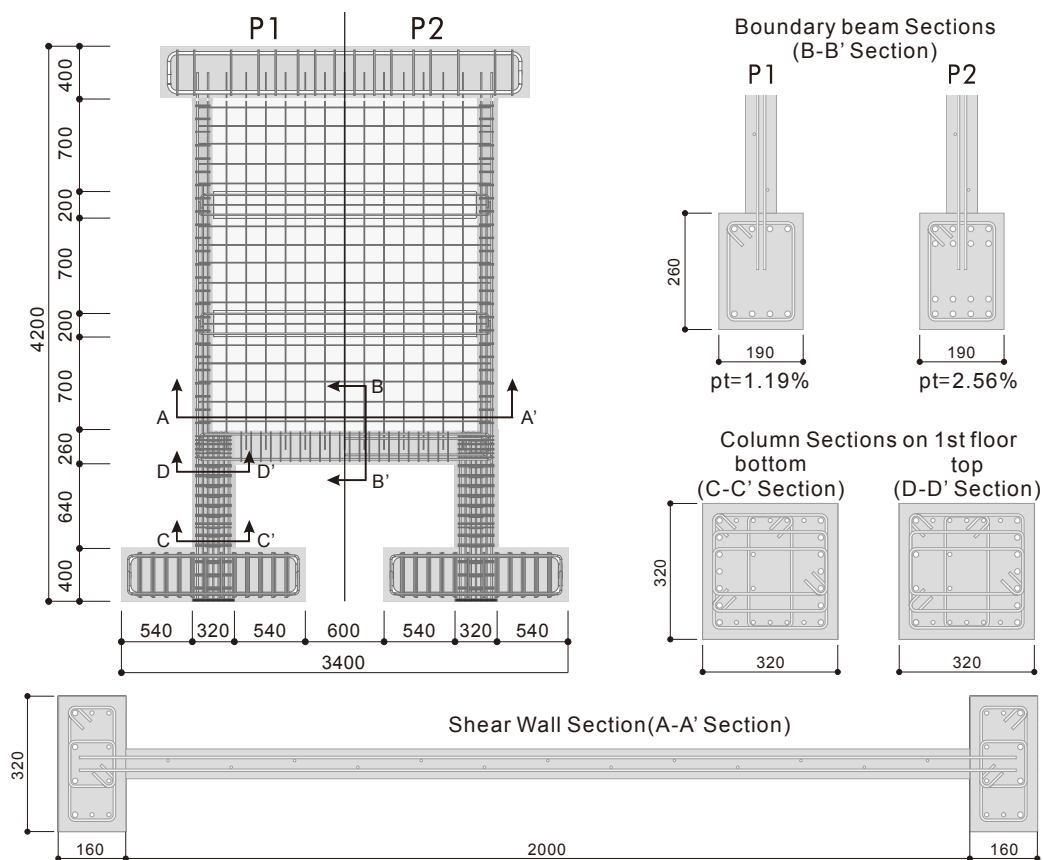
Configuration and reinforcement arrangement (unit: mm)
